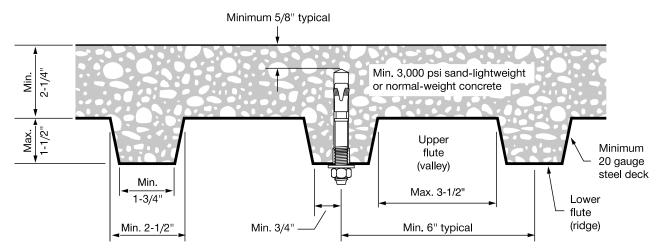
Installation of KWIK Bolt TZ in the soffit of concrete over metal deck floor and roof assemblies - B Deck
